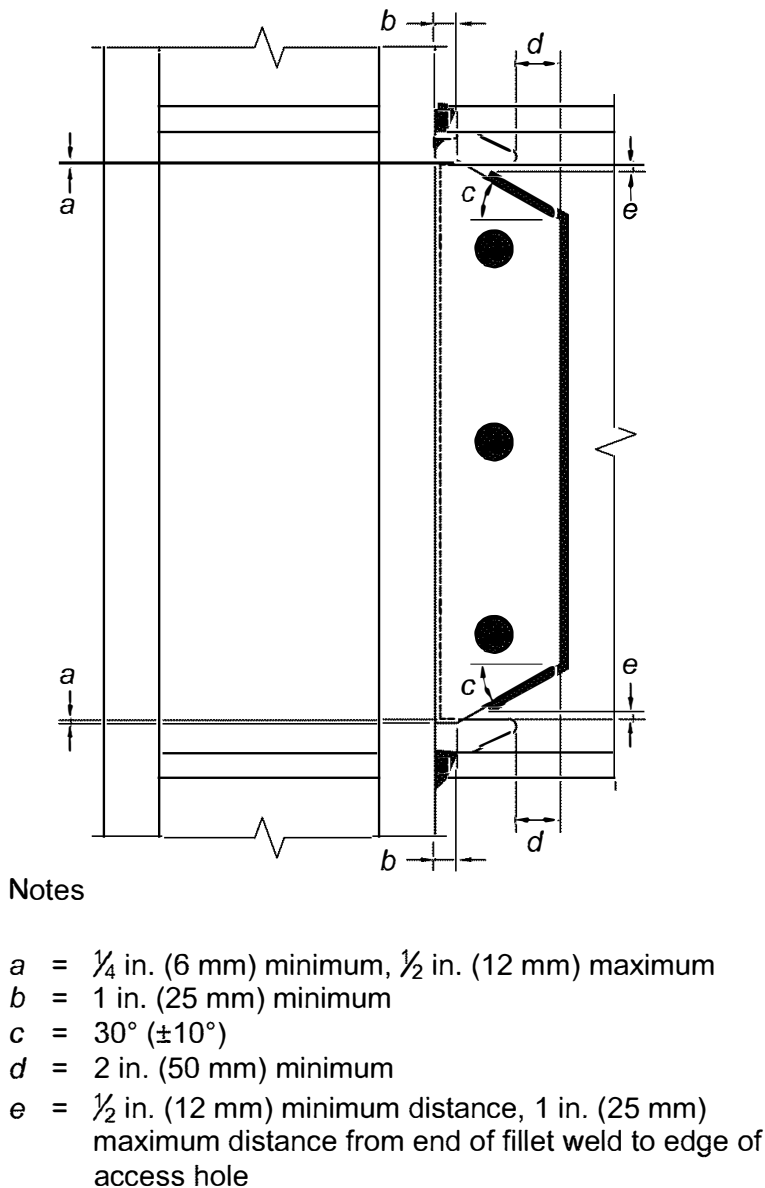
Details at top and bottom of single-plate shear connection.
